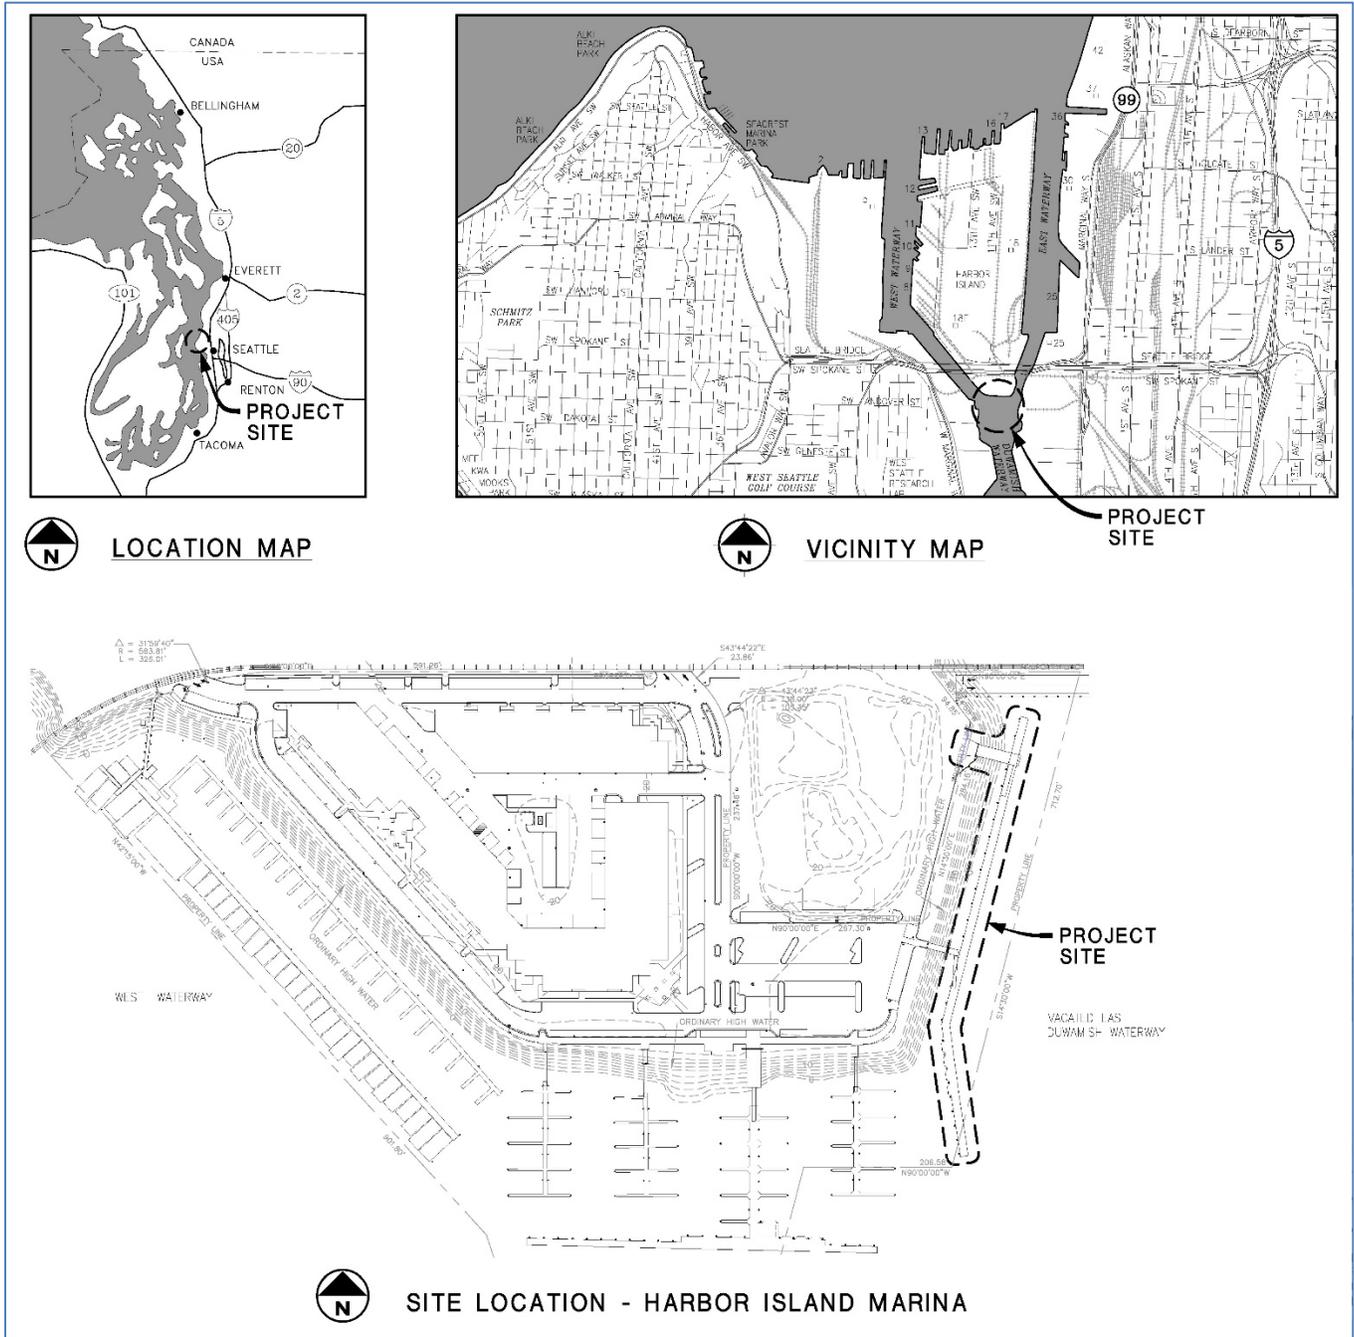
Harbor Island Marine Dock E Float and North Pier Improvements Site Plan
